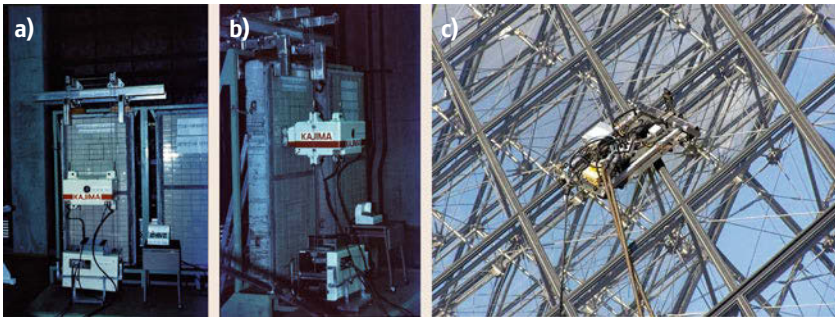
c Kajima facade inspection robot (a,b); Comatec Robosoft glass cleaning robot (c)
